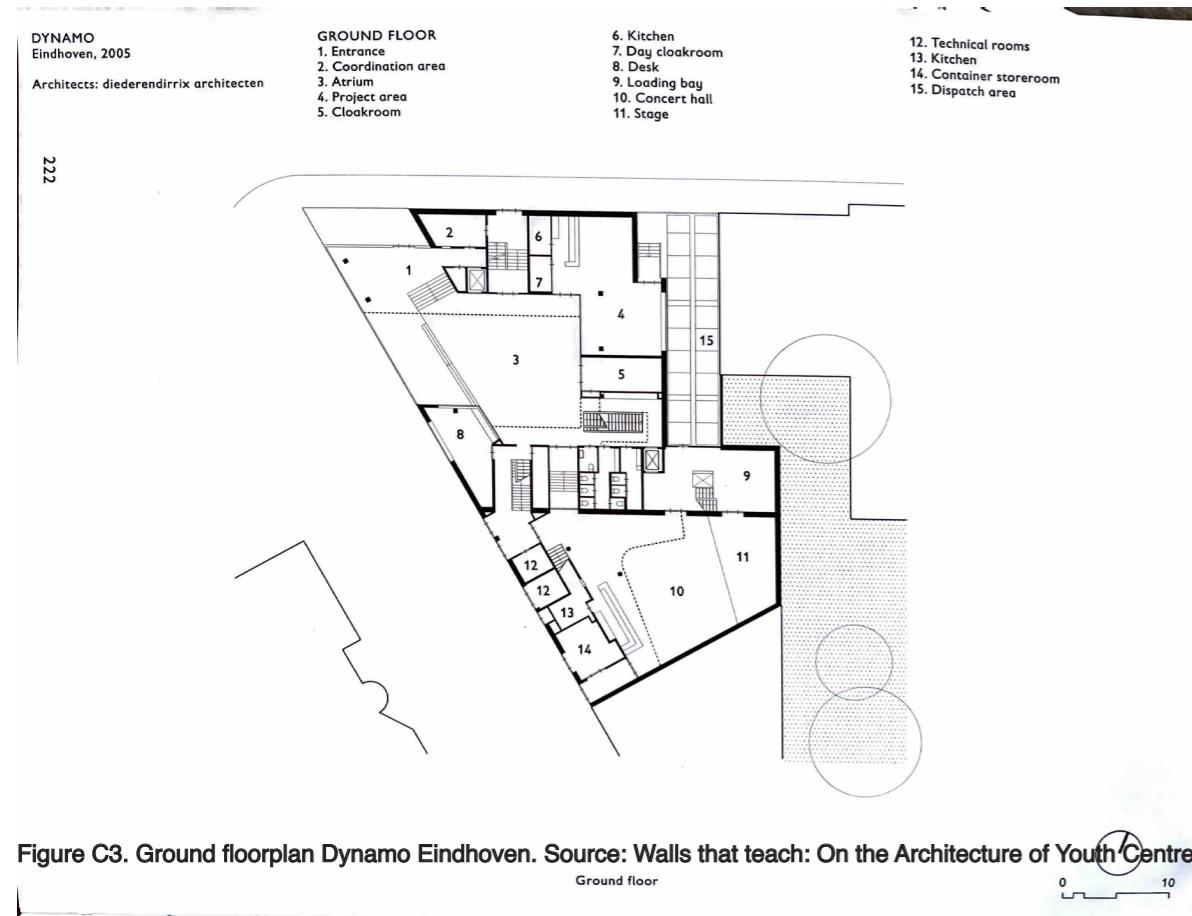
Ground floorplan Dynamo Eindhoven. Source: Walls that teach: On the Architecture of Youth Centres, 2015.
